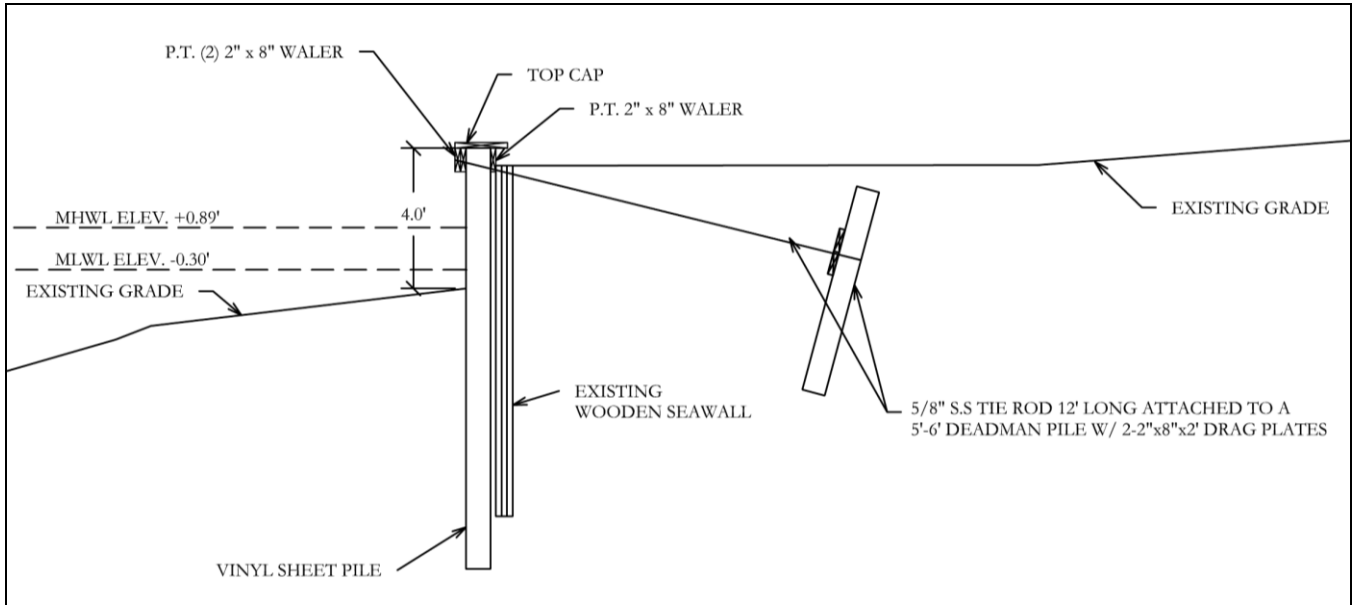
Vinyl Sheet Pile Seawall (Tied)
